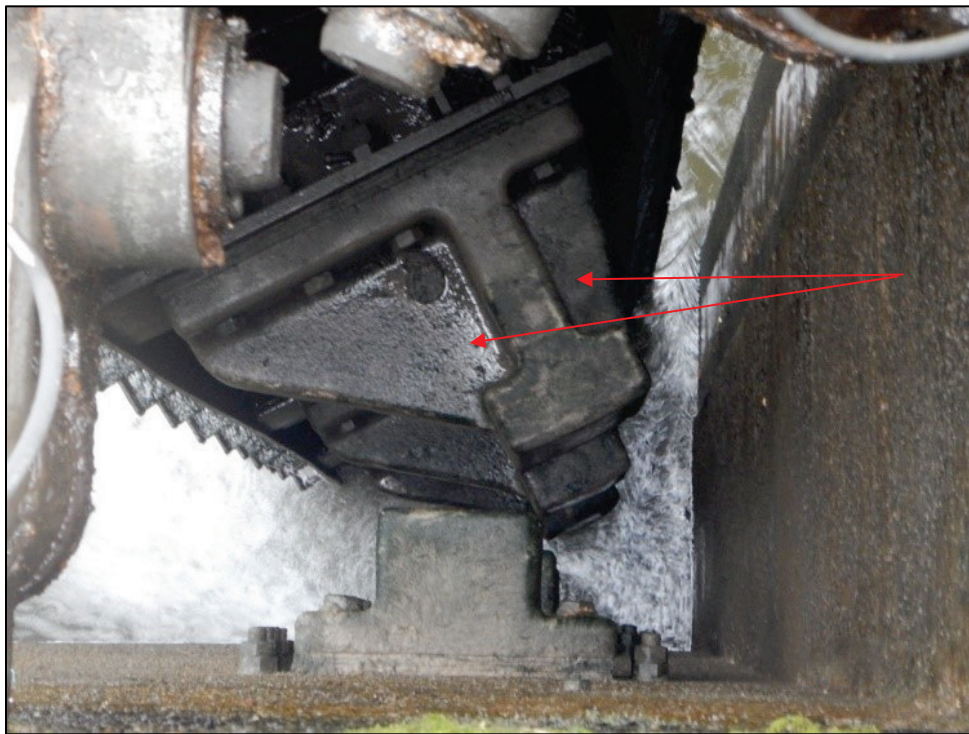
Locks on the Dnieper River, Ukraine, showing intermittent contact surfaces.
